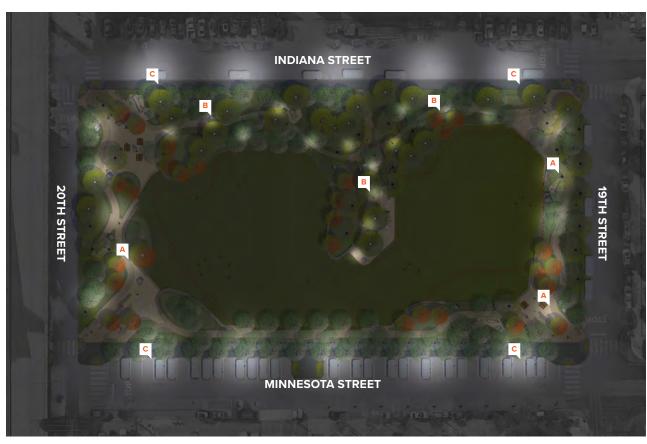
SCHEMATIC LIGHTING PLAN FOR ESPRIT PARK
